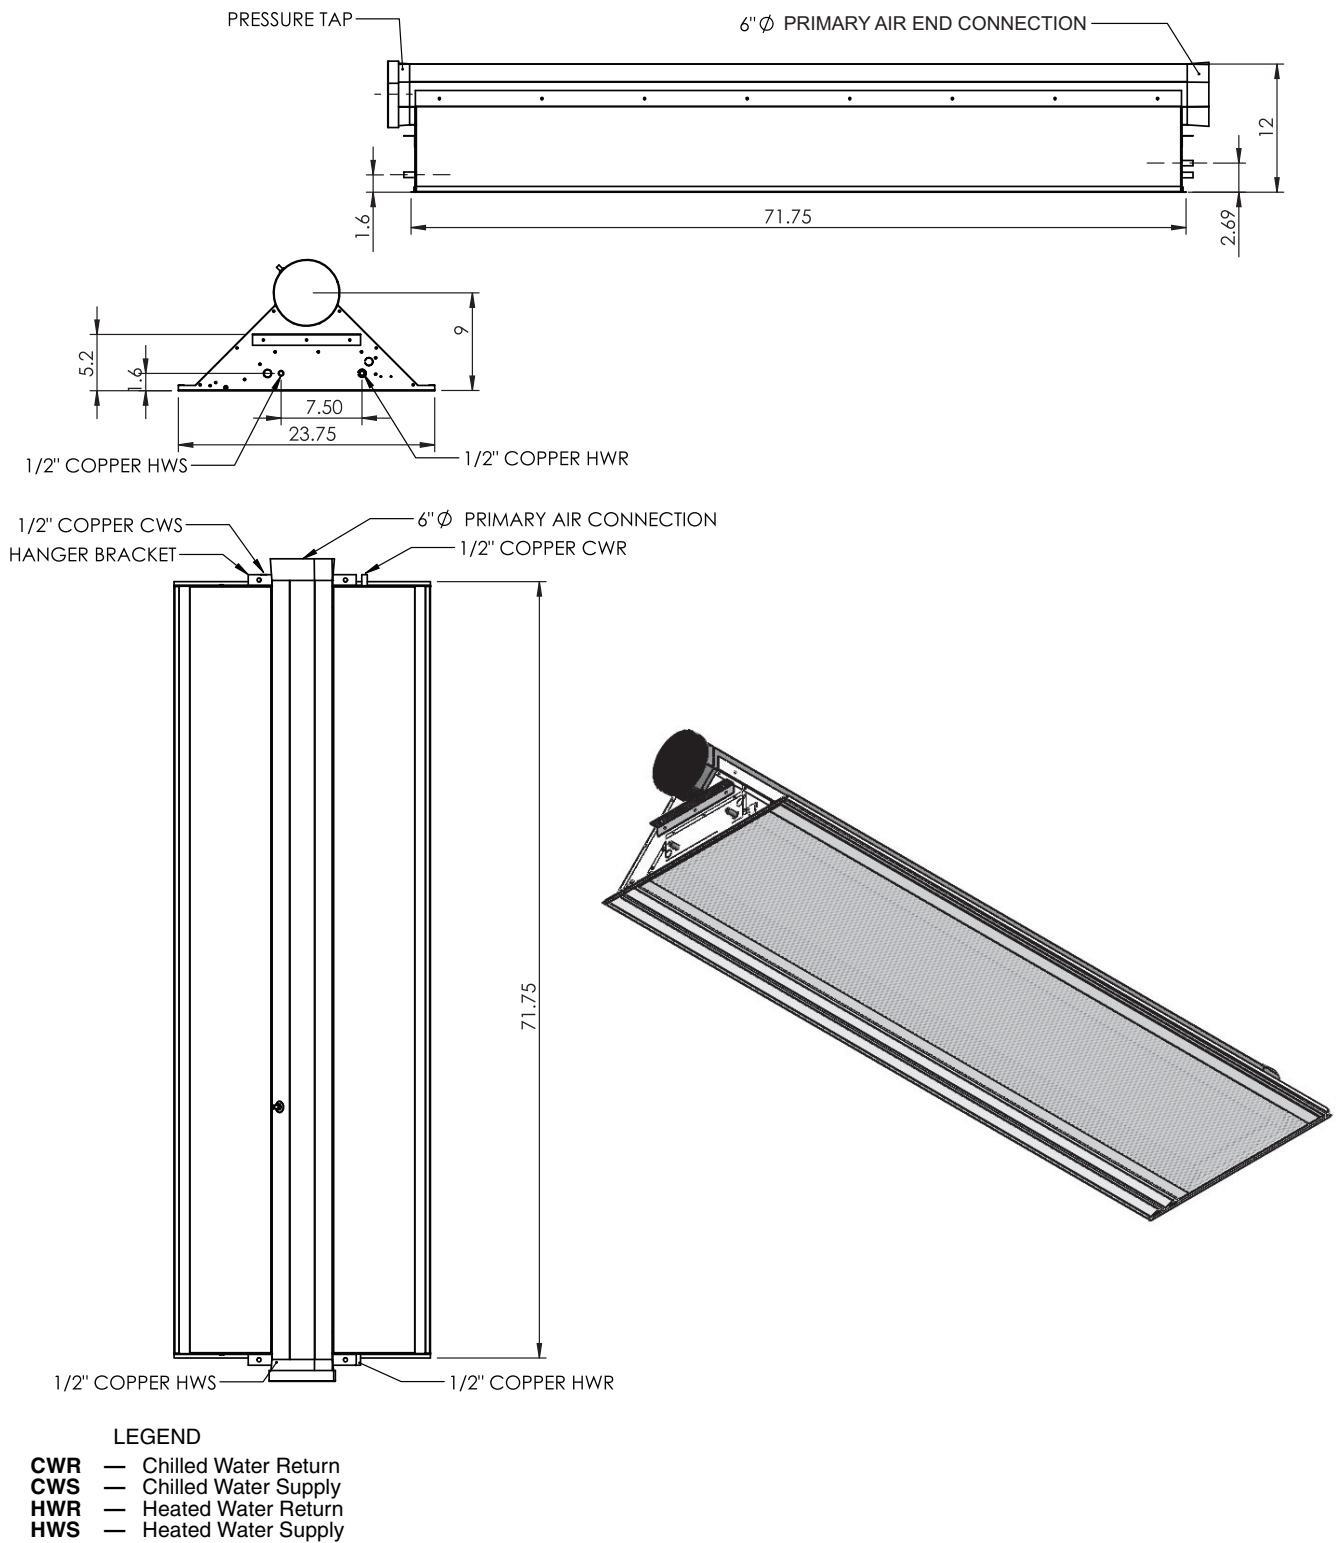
36CBAJ, 4-Pipe, Size 06 Unit Dimensions
